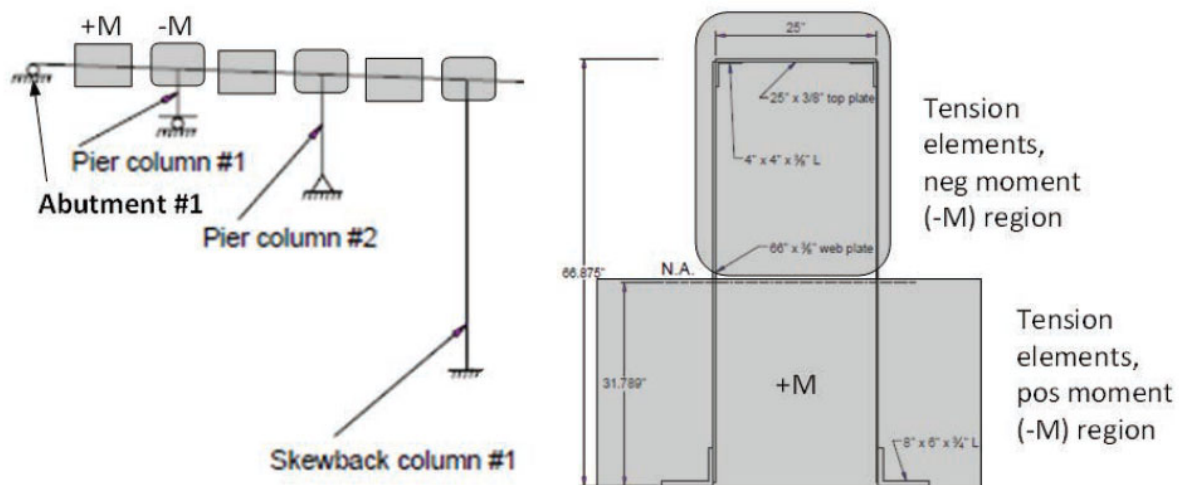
Tension elements of nonredundant steel tension members - spandrel girder (span #1-#3).
